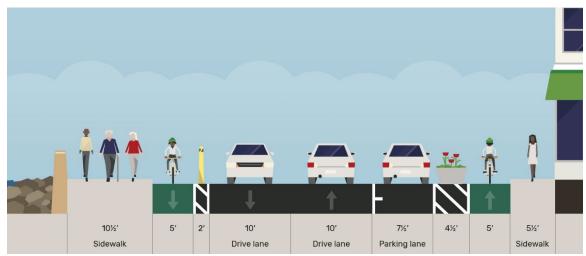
Typical Option 3 Cross Section – One-Way Protected Bike Lanes
